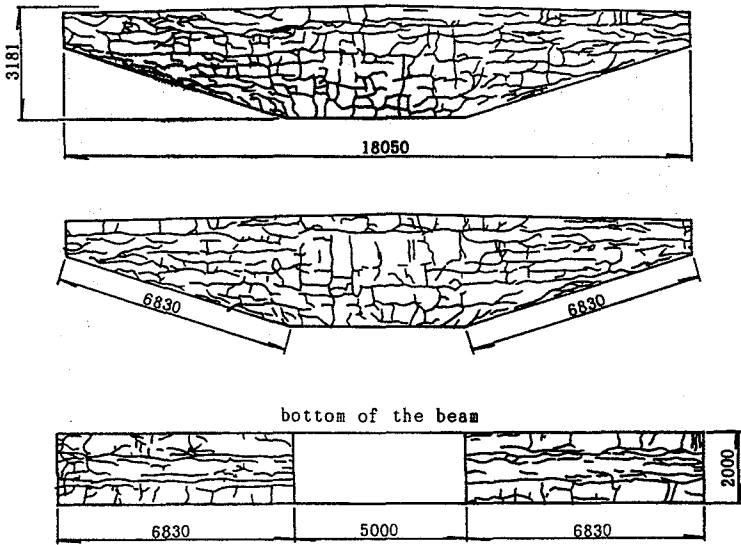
Damaged beam of a T-shape bridge pier
